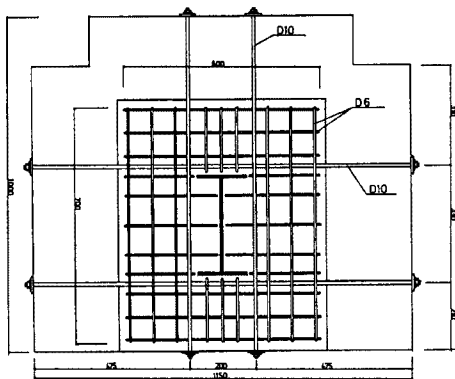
(d). Detail of reinforcement of additional concrete cover (Unit: mm).
